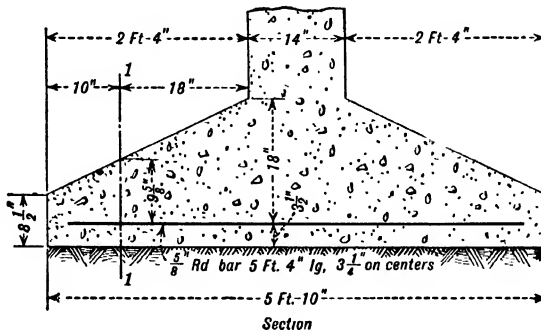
Sloped Wall Footing. (See p. 485.)
